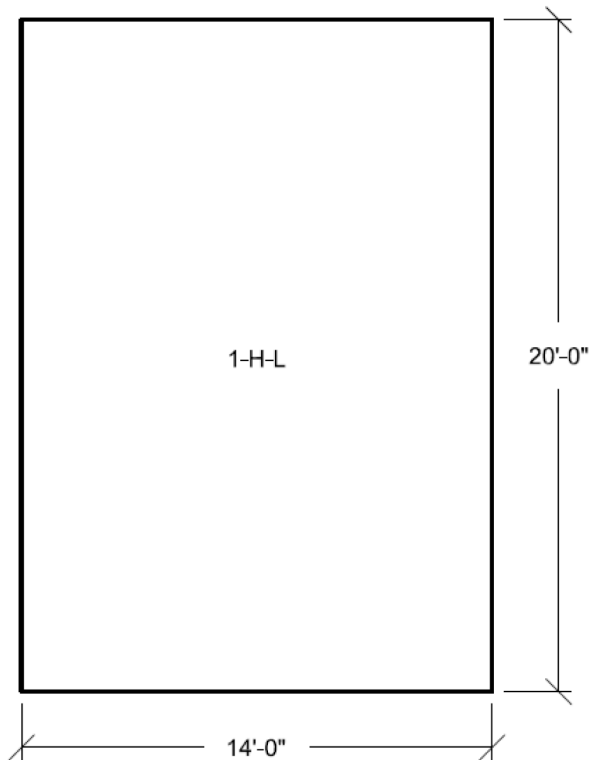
H.6-179 DGFOV Wall 10 Looking From Outside Horizontal Reinforcement Zones Far Side Face
